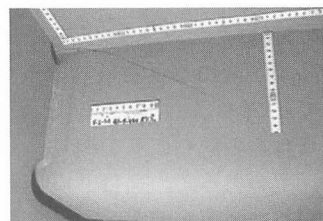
An Example of fatigue crack occurred at a welded joint³⁾
